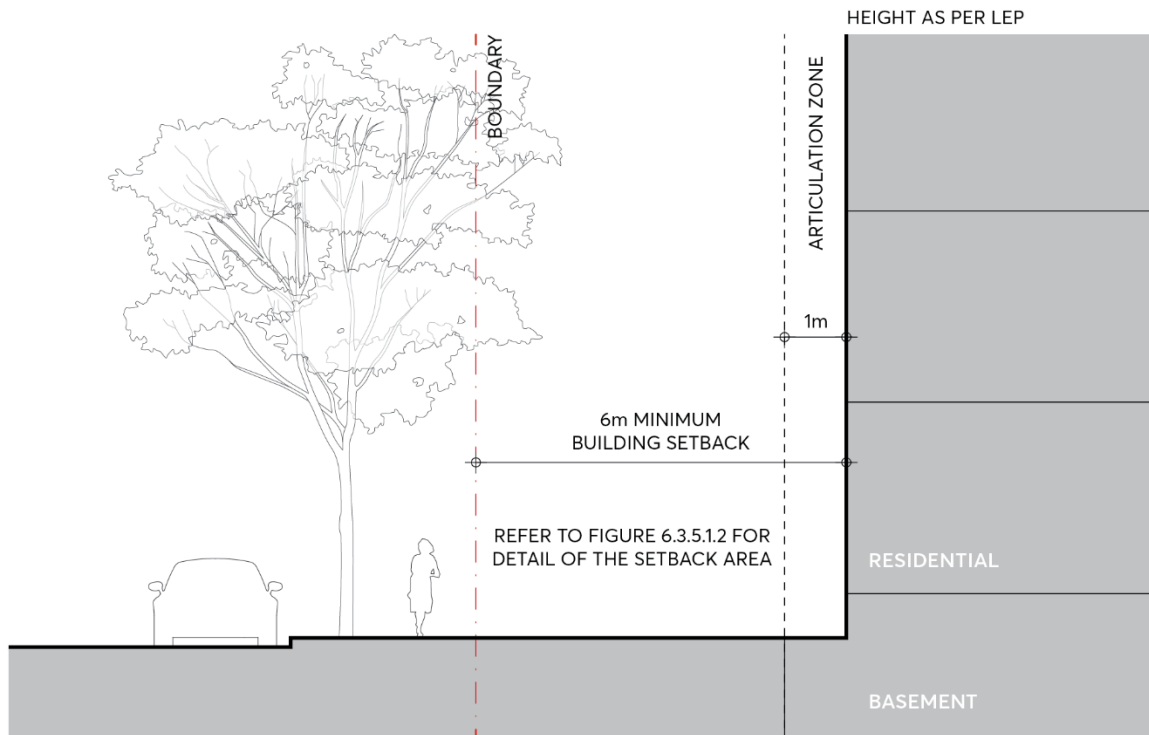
Street Setbacks - Residential Ground Floor street frontage
